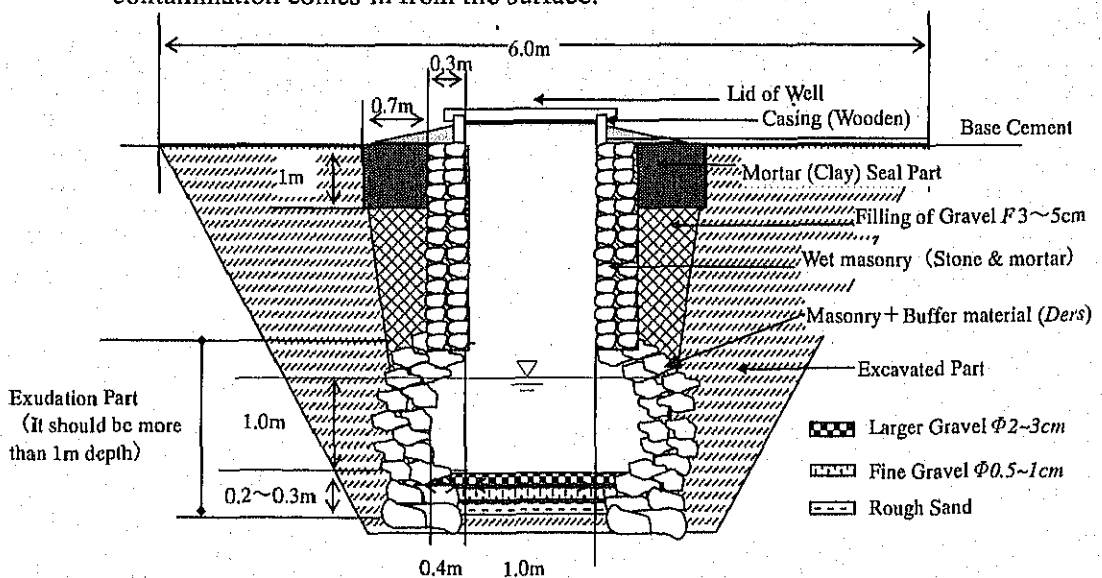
Structure of Masonry Type Traditional Well
